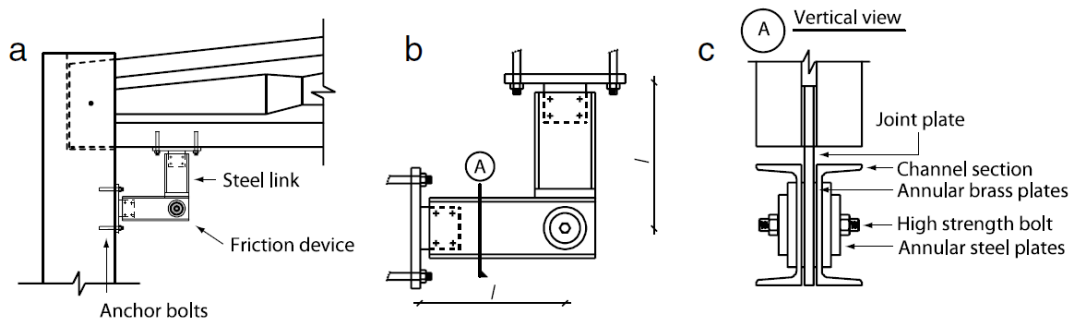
Beam-to-column connection friction dampers (Martinelli and Mulas 2010)
